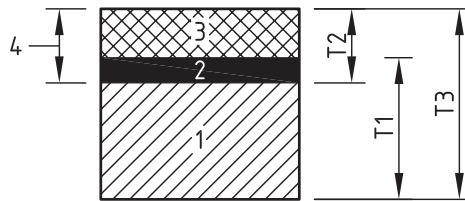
Waterproofing system including an asphalt layer as protection layer
